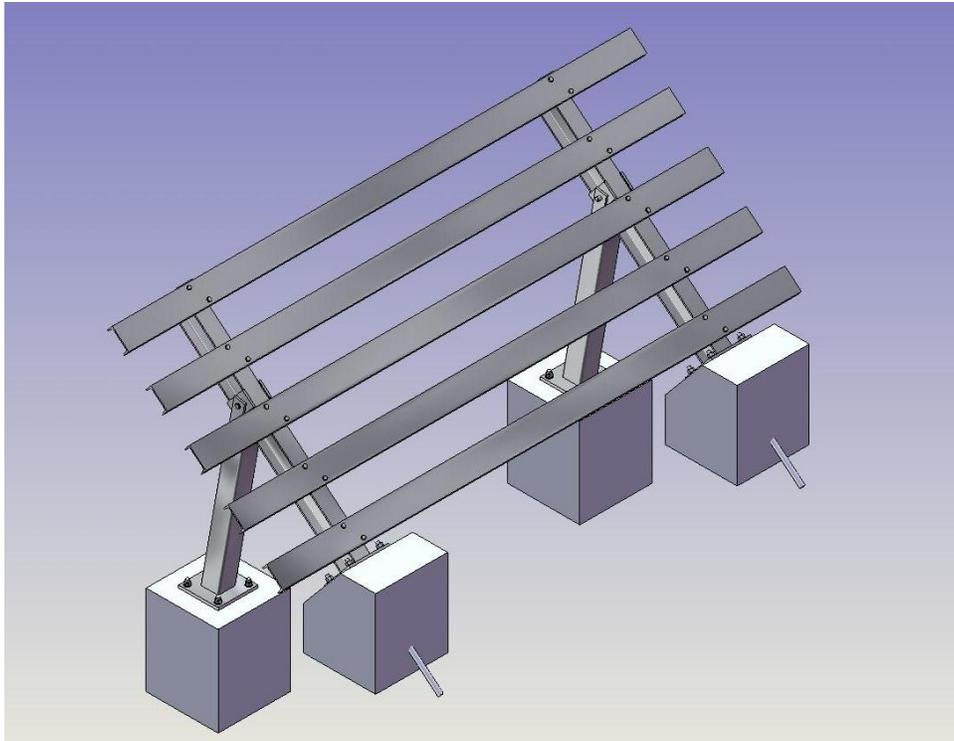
3D rendered view of the snow supporting structure on CIP concrete footings.
